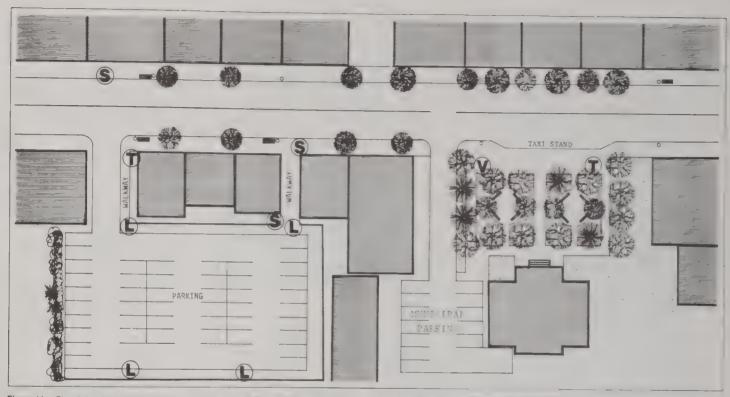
Plan 4, low budget improvements to a linear Main Street with prominent heritage properties. Improve park to accent heritage buildings and to act as a focal point for Main Street. Remove on-street parking and build large new lot increar of Main Street.
